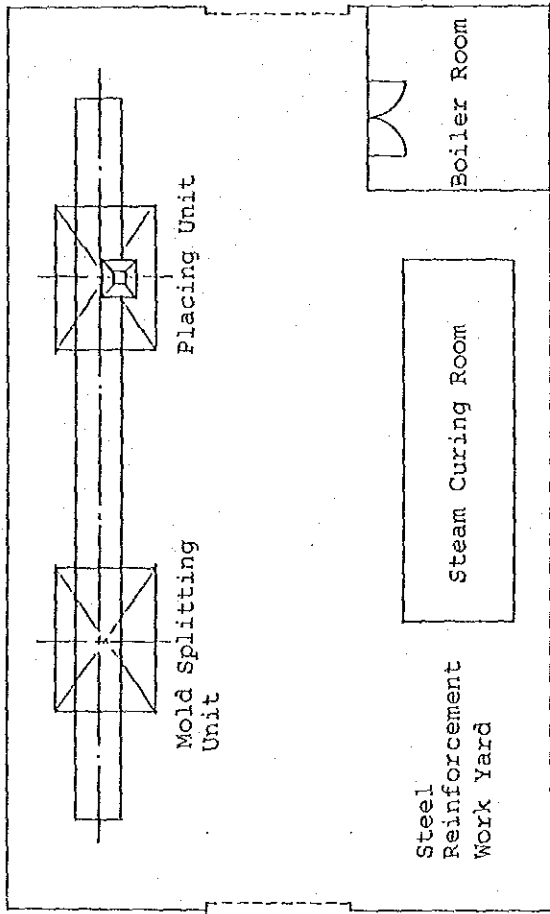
PLAN OF PRECAST CONCRETE PLANT Scale 1:200
